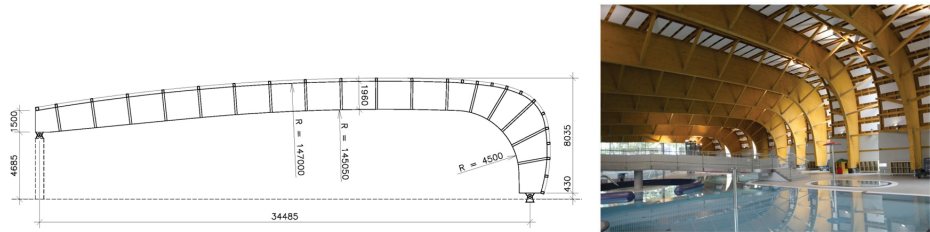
Configuration of the main frame rib of the span of 34.05 m. Realised timber structure.
